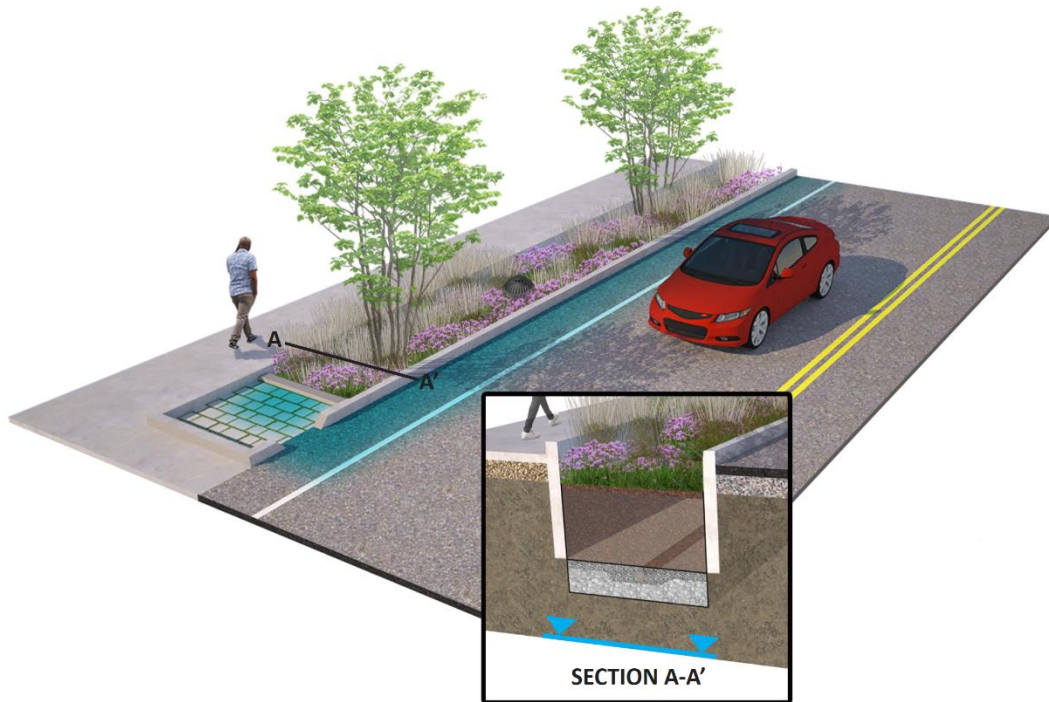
Curb inlet bioretention planter between sidewalk and roadway
